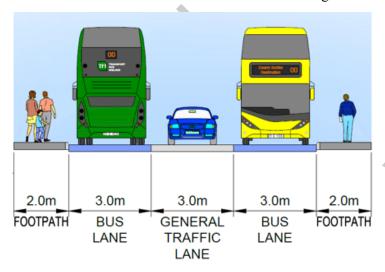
Section 2, Proposed Option 3 - Cross Section A-A
